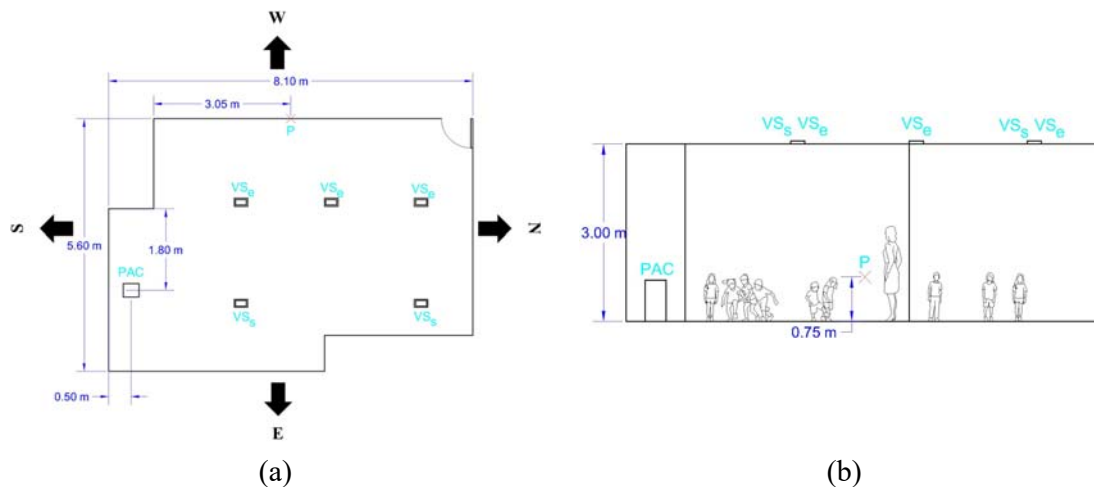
Experimental classroom setup: (a) Plan view (b) Elevation view.
